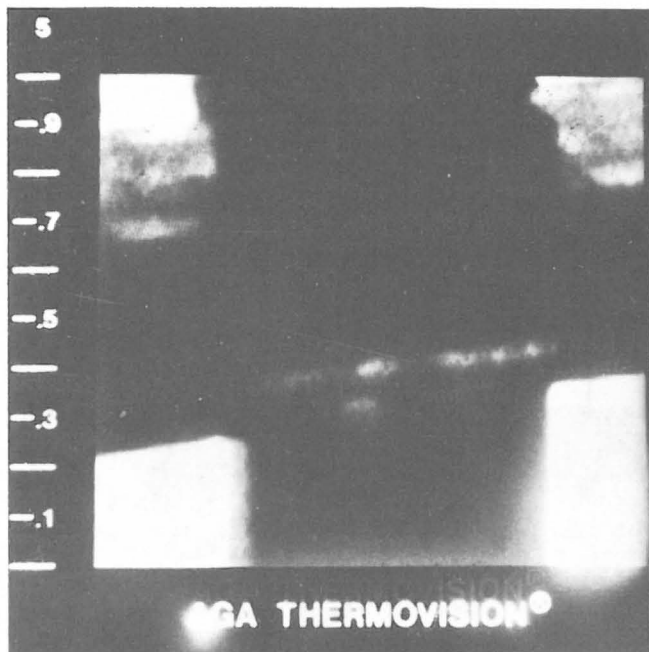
Infrared photo of column beam intersection. Horizontal white line at top of lower column locates large void in back up in old solid masonry wall.
